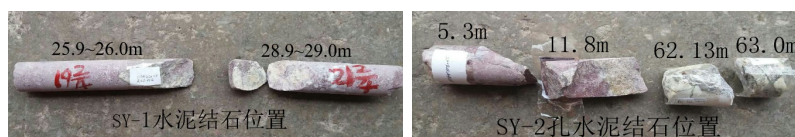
The cement stone picture of SY-1 and SY-2 after grouting
